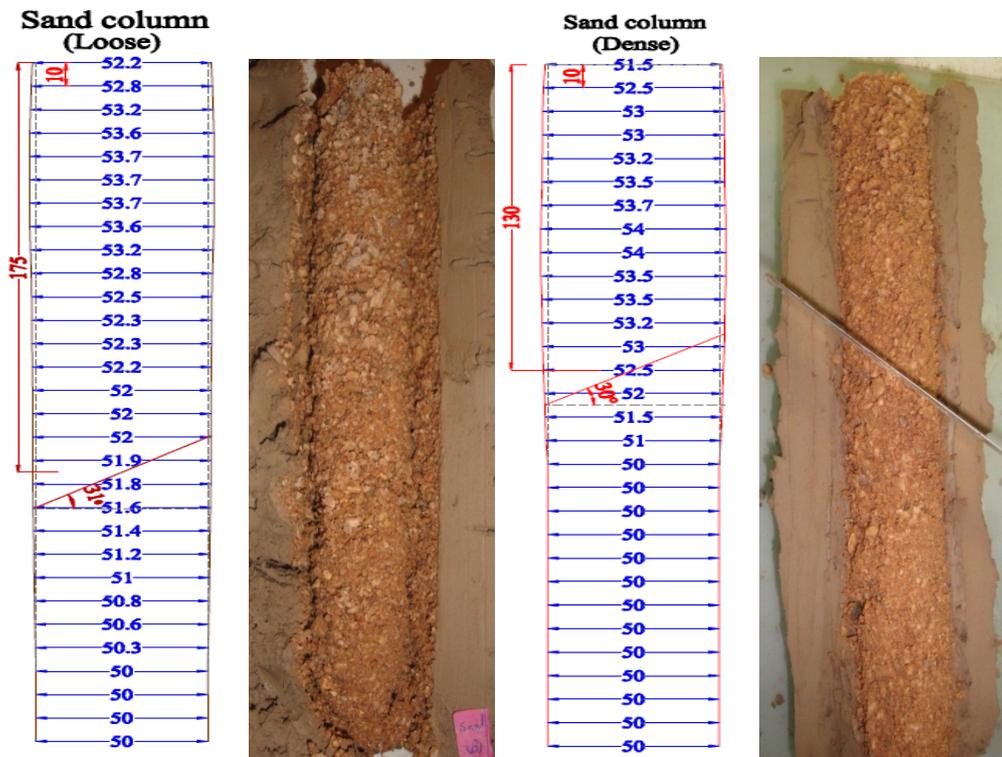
The deformation of end bearing sand columns at the end of test (all dimensions in mm).
